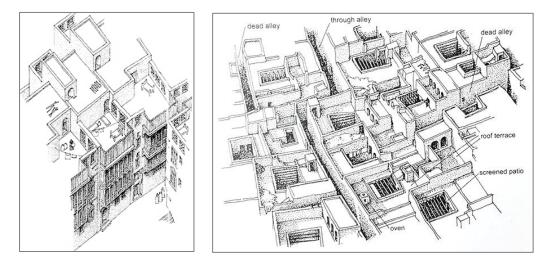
Roof terraces in traditional residential buildings in: (a) Mecca, KSA; (b) Algeria (Ragette 2003)
